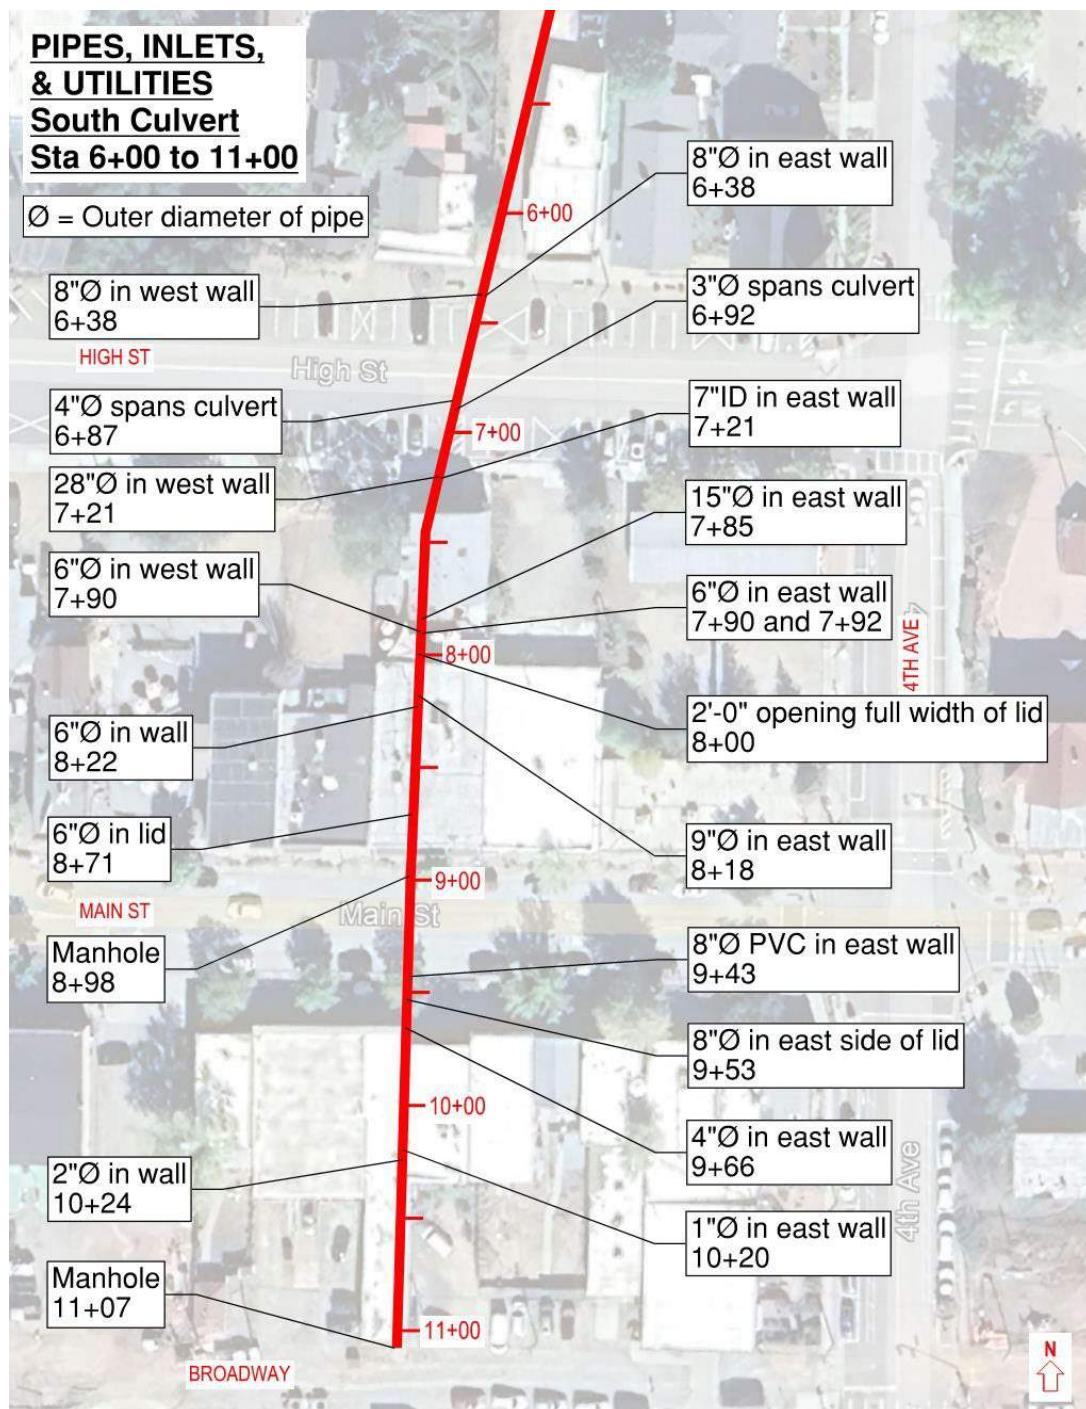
South Culvert Incoming Pipes, Utilities, Inlets Stations (S)6+00 to (S)11+00
